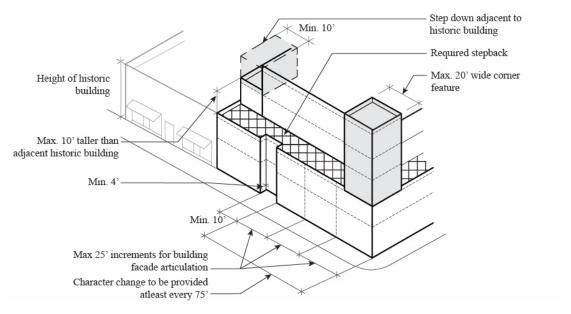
Example of stepdown adjacent to historic buildings and taller massing at the block corner.
